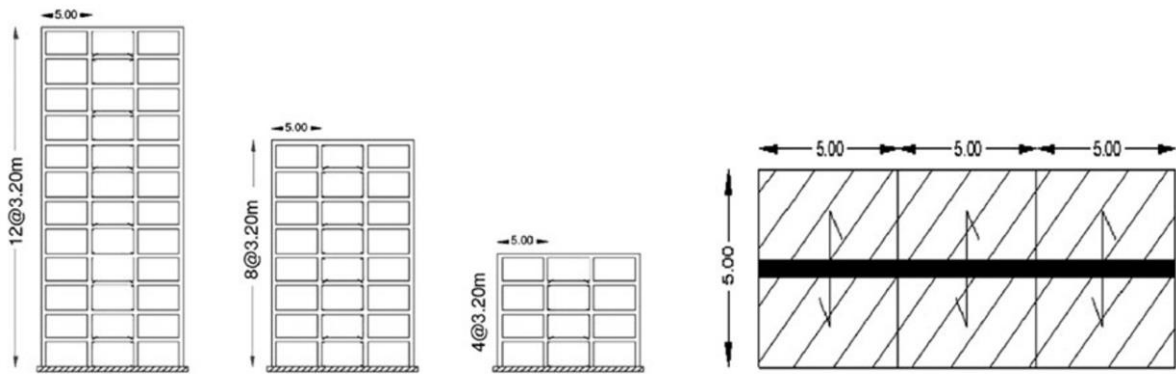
Plan and Elevation of the RC Frame Models. [12]
